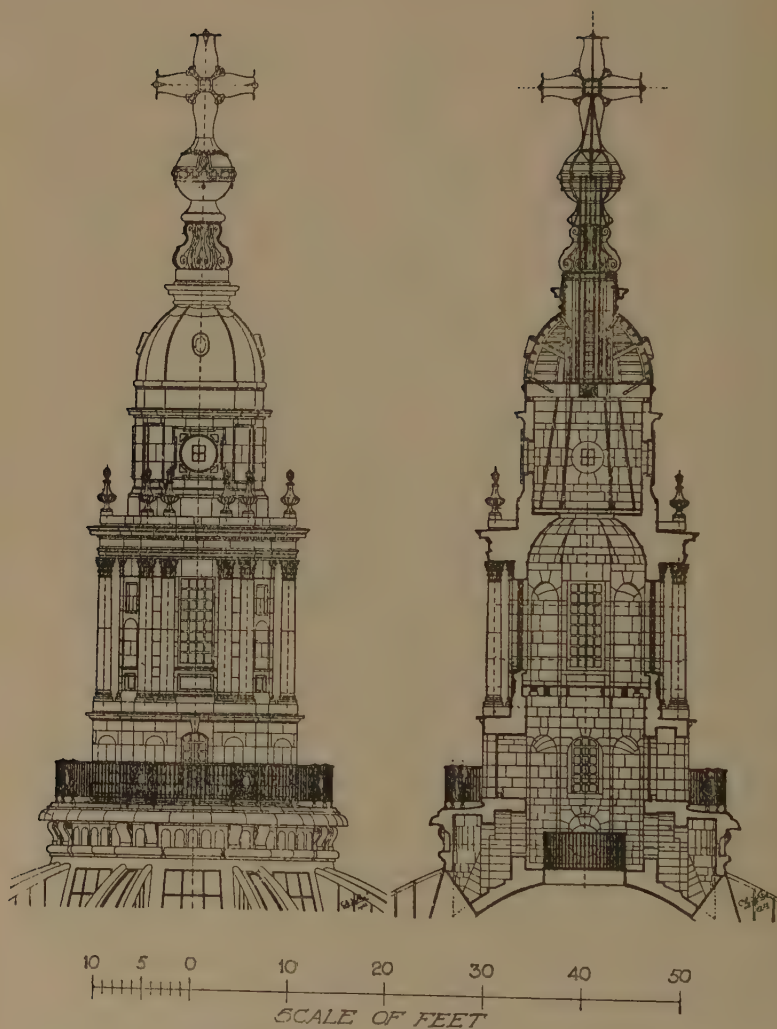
A. St. Paul's Cathedral. Elevation and Section of the Lantern.
